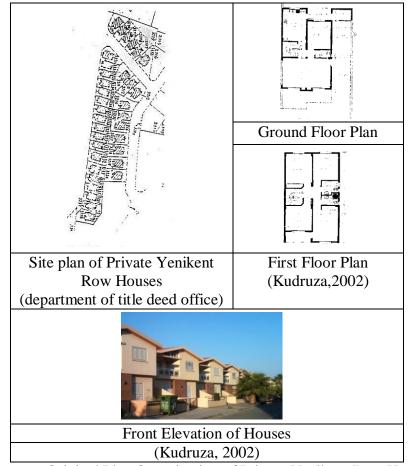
Original Plan Organization of Private Yenikent Row Houses.
